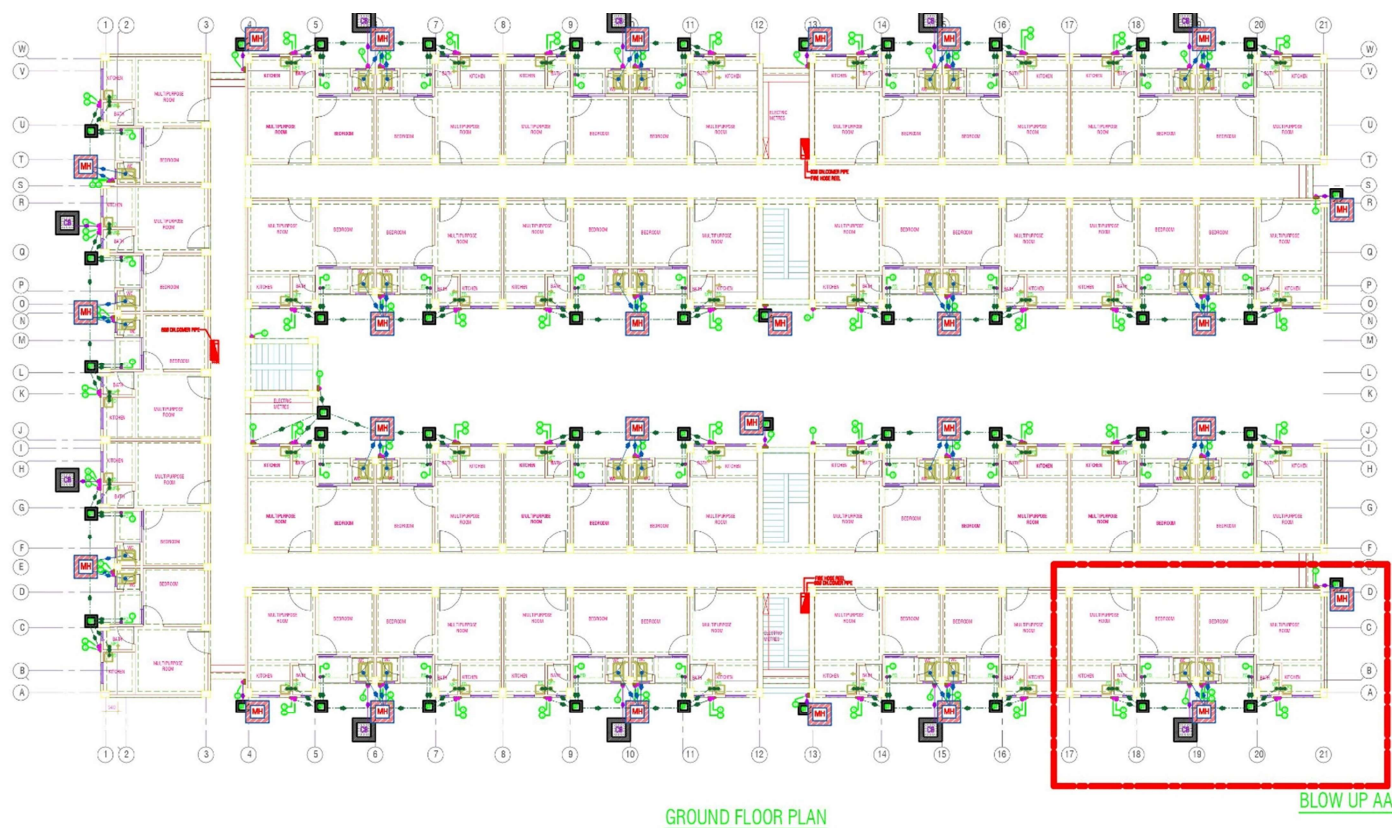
Plumbing layout of a residential tower (Author, 2021)
